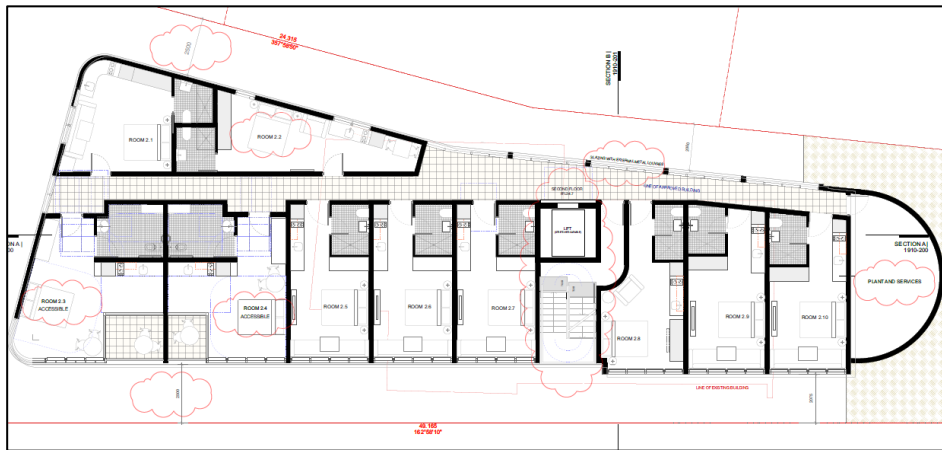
Approved second floor plan under DA/222/2020 (Source: SHED)
